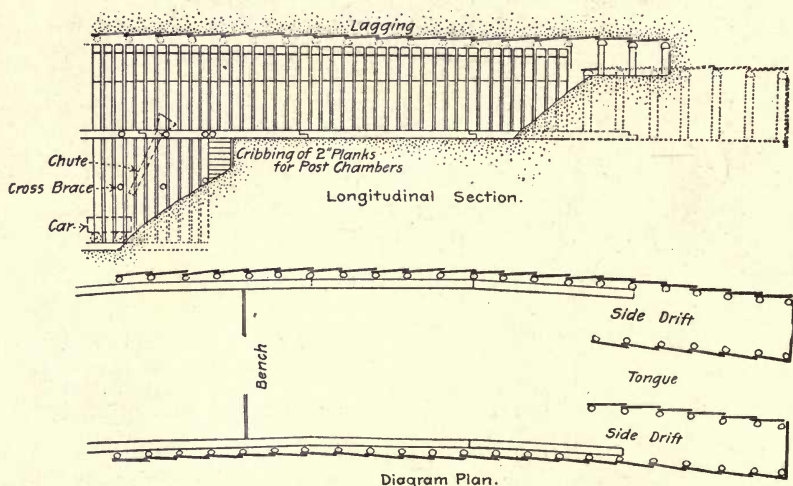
Crow's Nest Pass Tunnel; Longitudinal Section and Plan, Showing Method of Driving.
